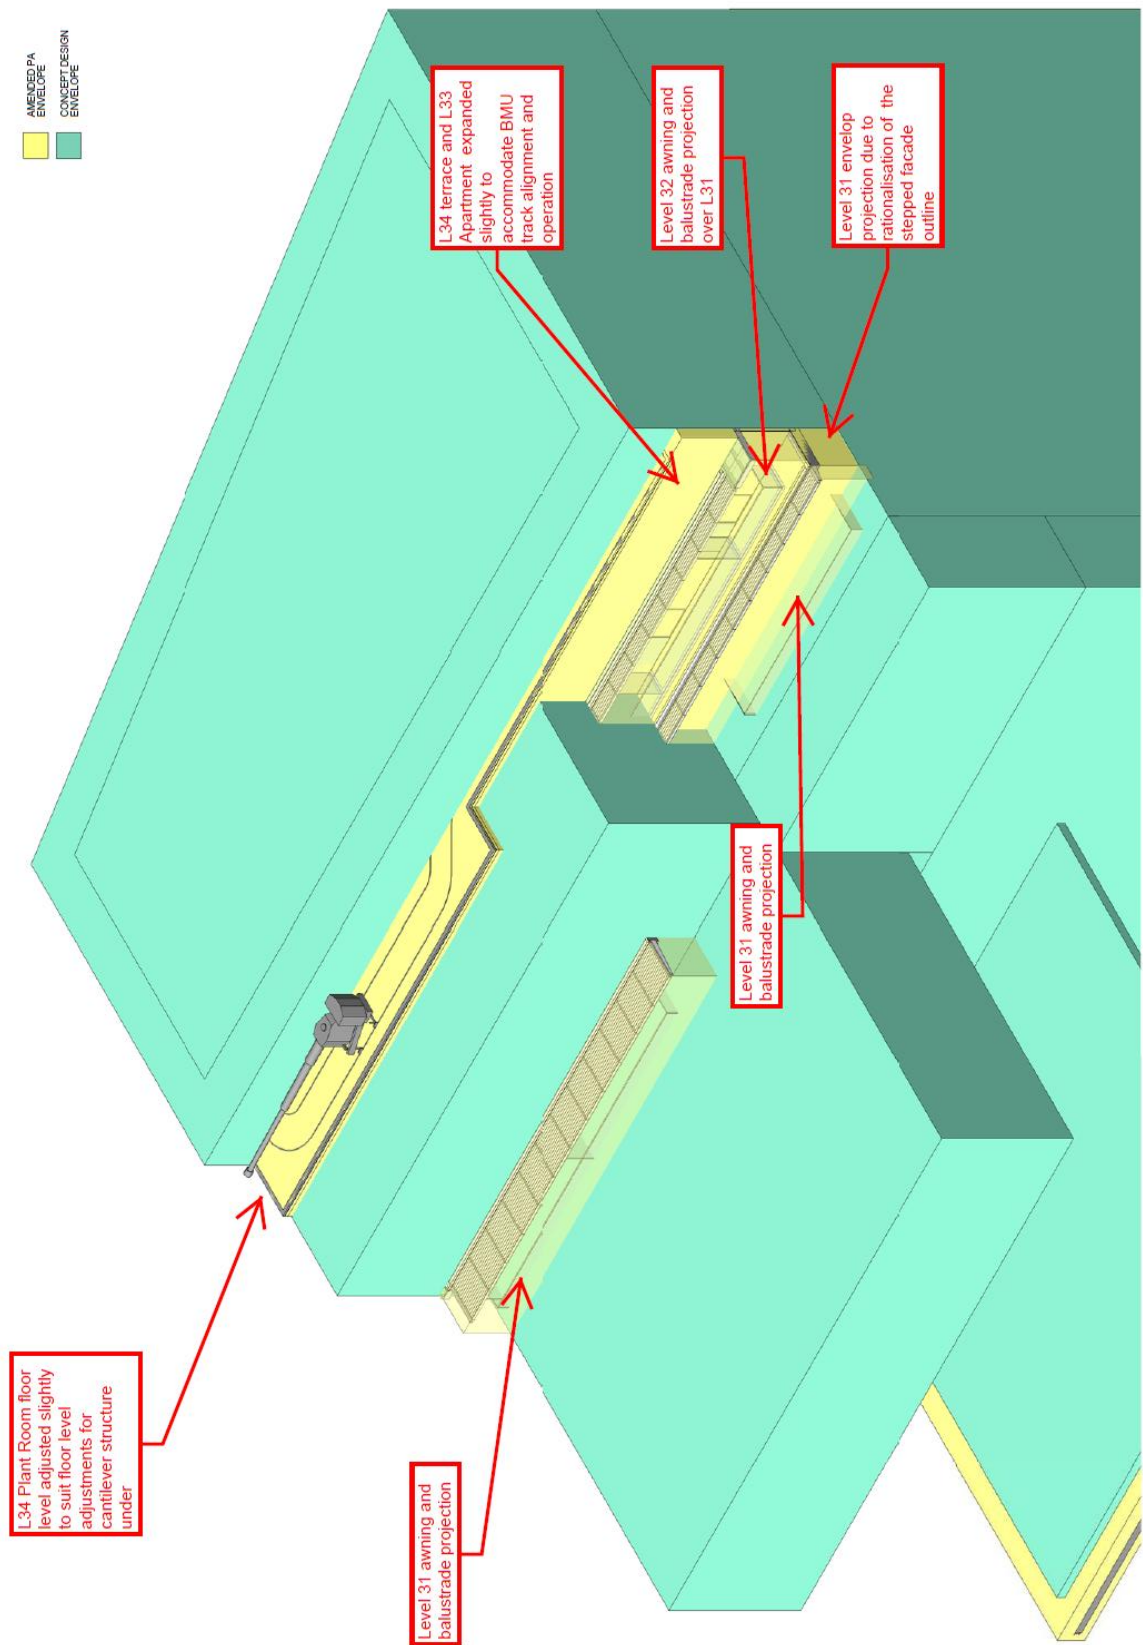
Comparison of Concept Plan (aqua) and proposed (yellow) building envelopes – detailed view
